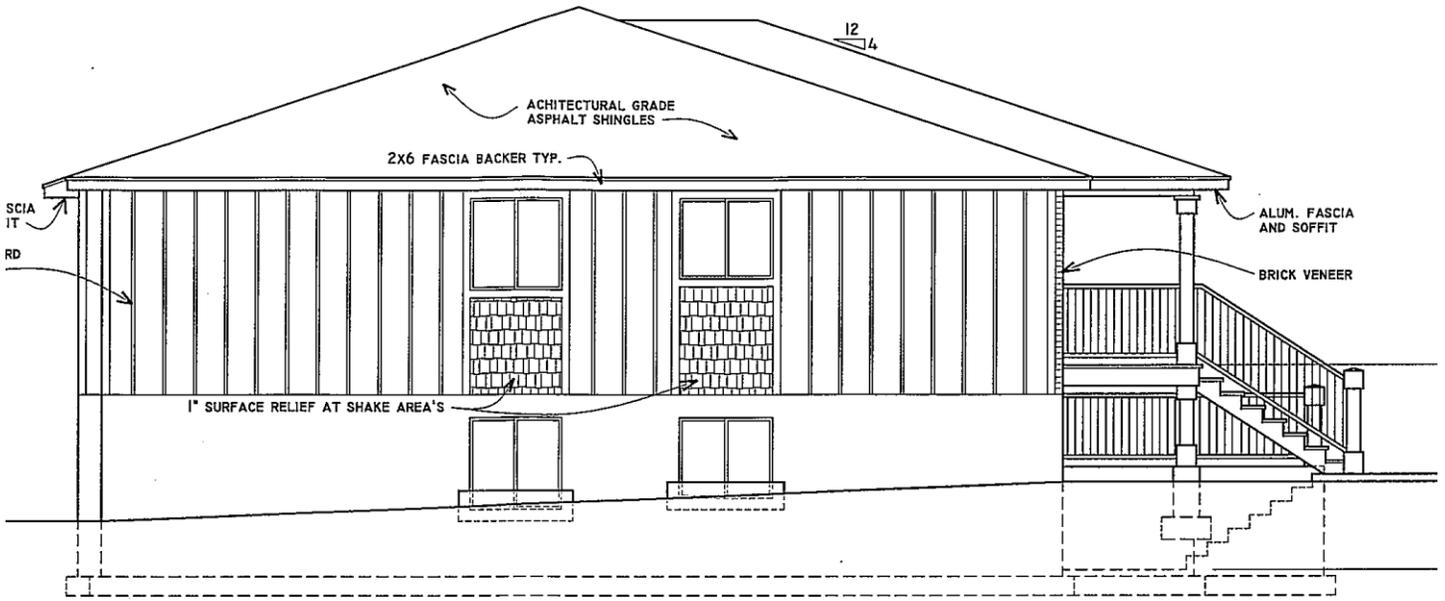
EXHIBIT "B" – PROPOSED BUILDING ELEVATIONS
